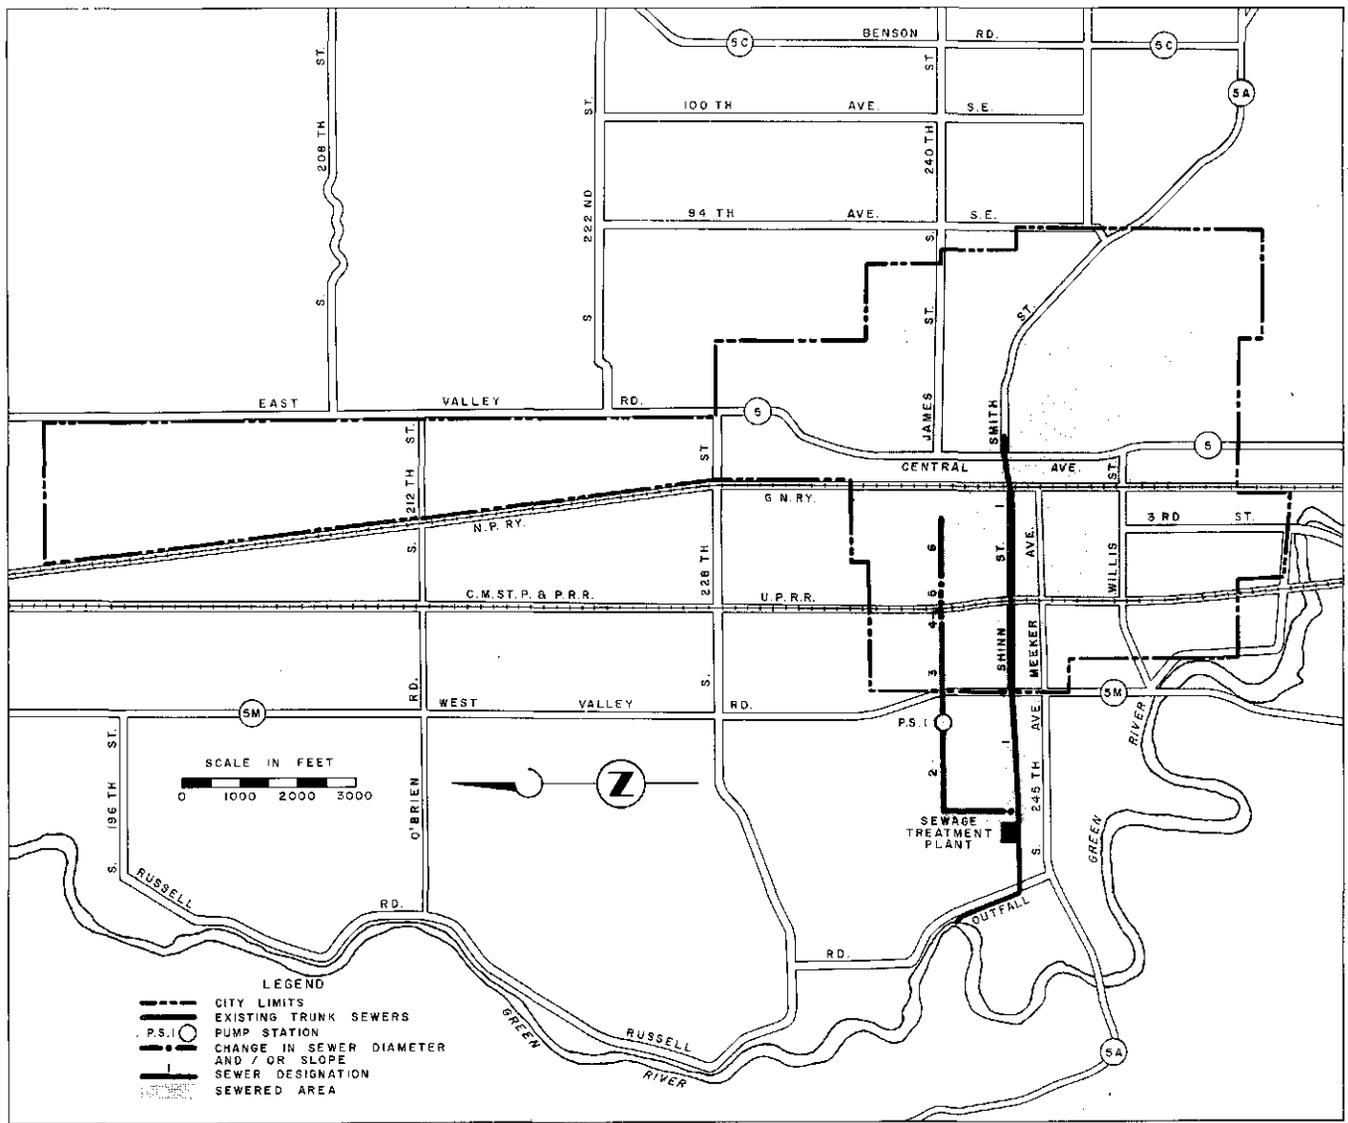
Sewered Area and Principal Sewerage Facilities City of Kent
